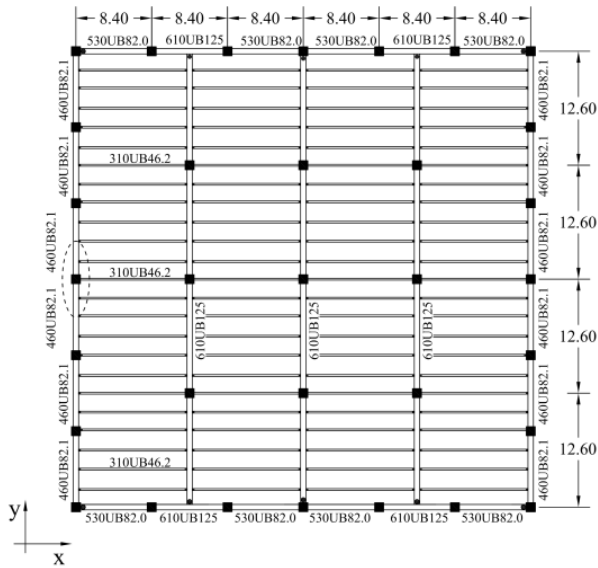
Floor plan of the model building. Beam ends with a dot are not moment resisting
